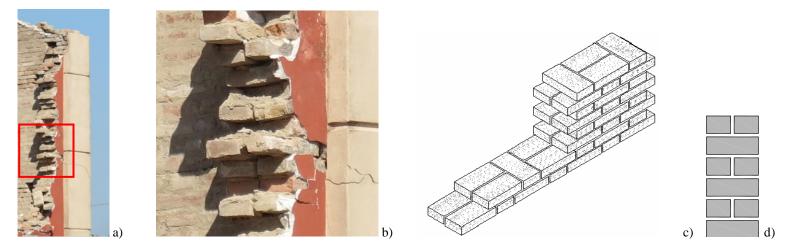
Double header brick masonry bond in church I3: general view (a), detail (b), sketch of the bond type adapted from Borri (2006) (c) and sketch of the cross section view of the wall (d)
